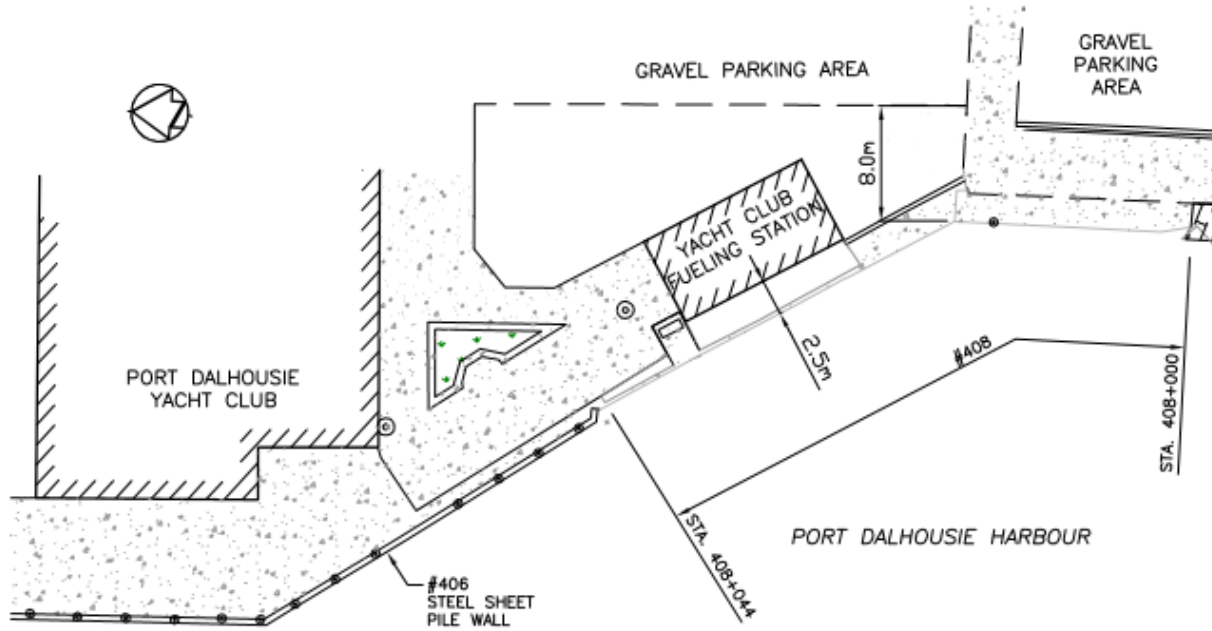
Layout of Infrastructure Behind East Concrete Wall (#408)
